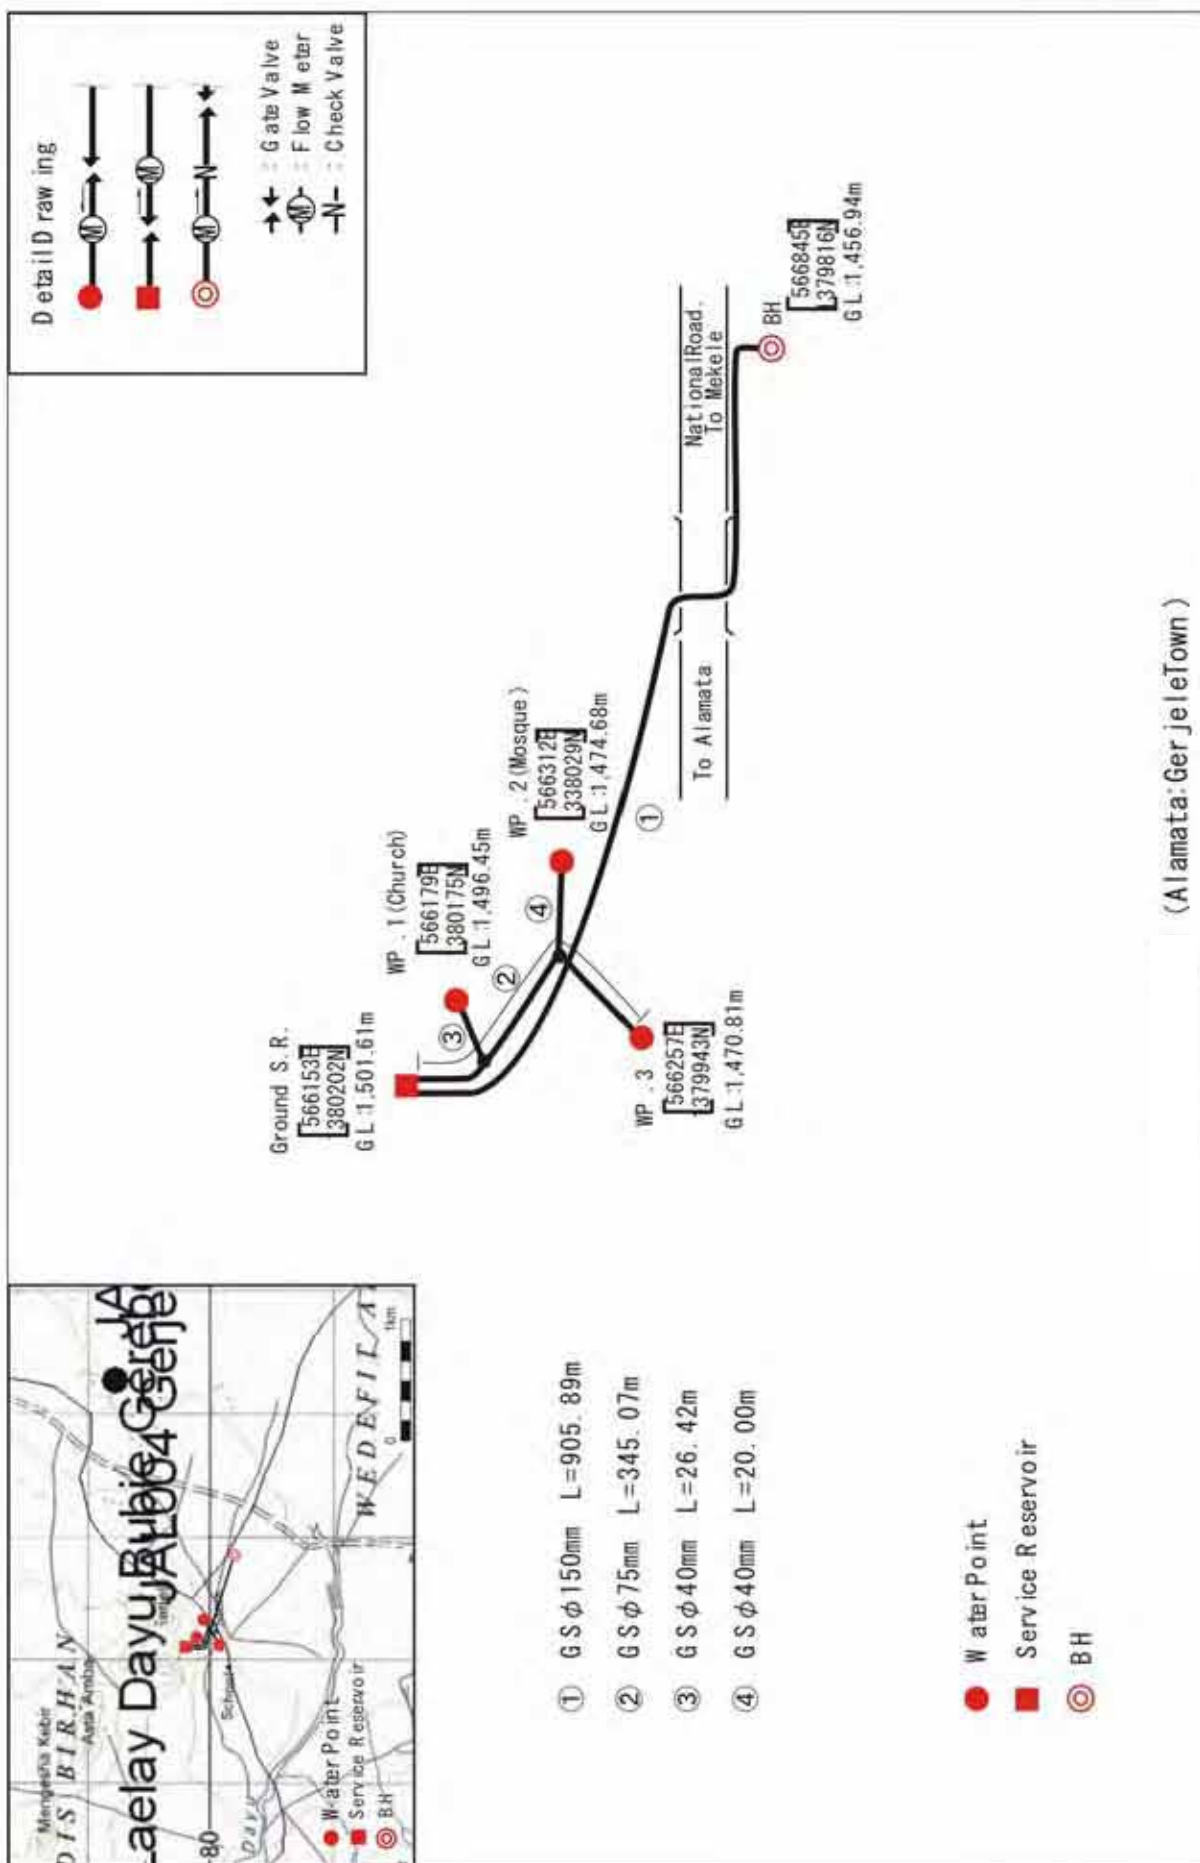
Layout for Water Supply Facility at Gerjele Town
